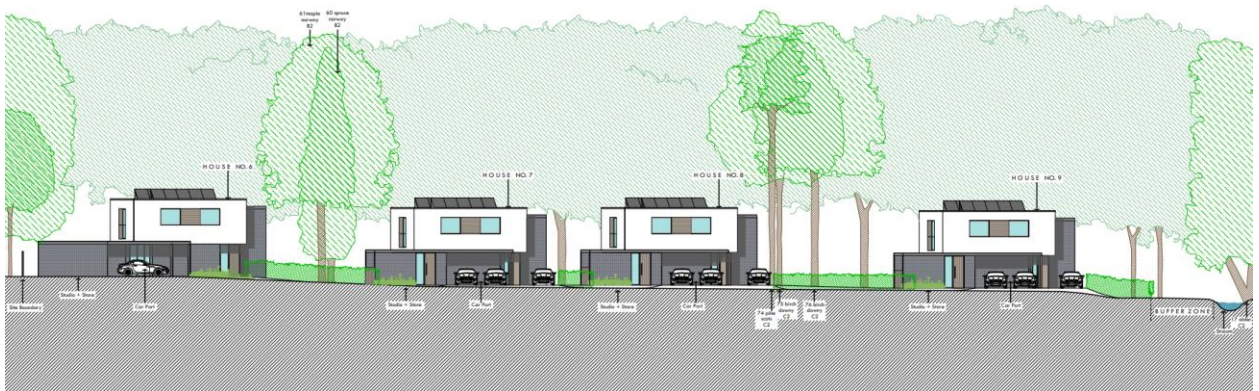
Extract from drawing number STU002 P2 showing north-west street scene elevation
